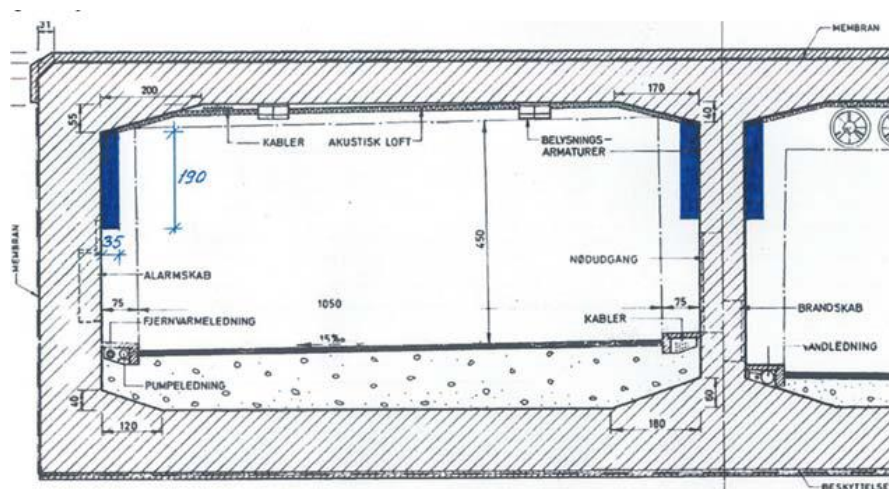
Additional prestressing for the Limfjord Tunnel, indicated with the blue boxes against the walls and just below the tunnel roof (ATKINS et al., 2019).
